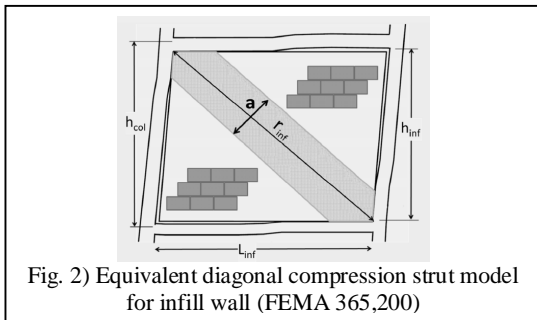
Equivalent diagonal compression strut model for infill wall (FEMA 365,200)
